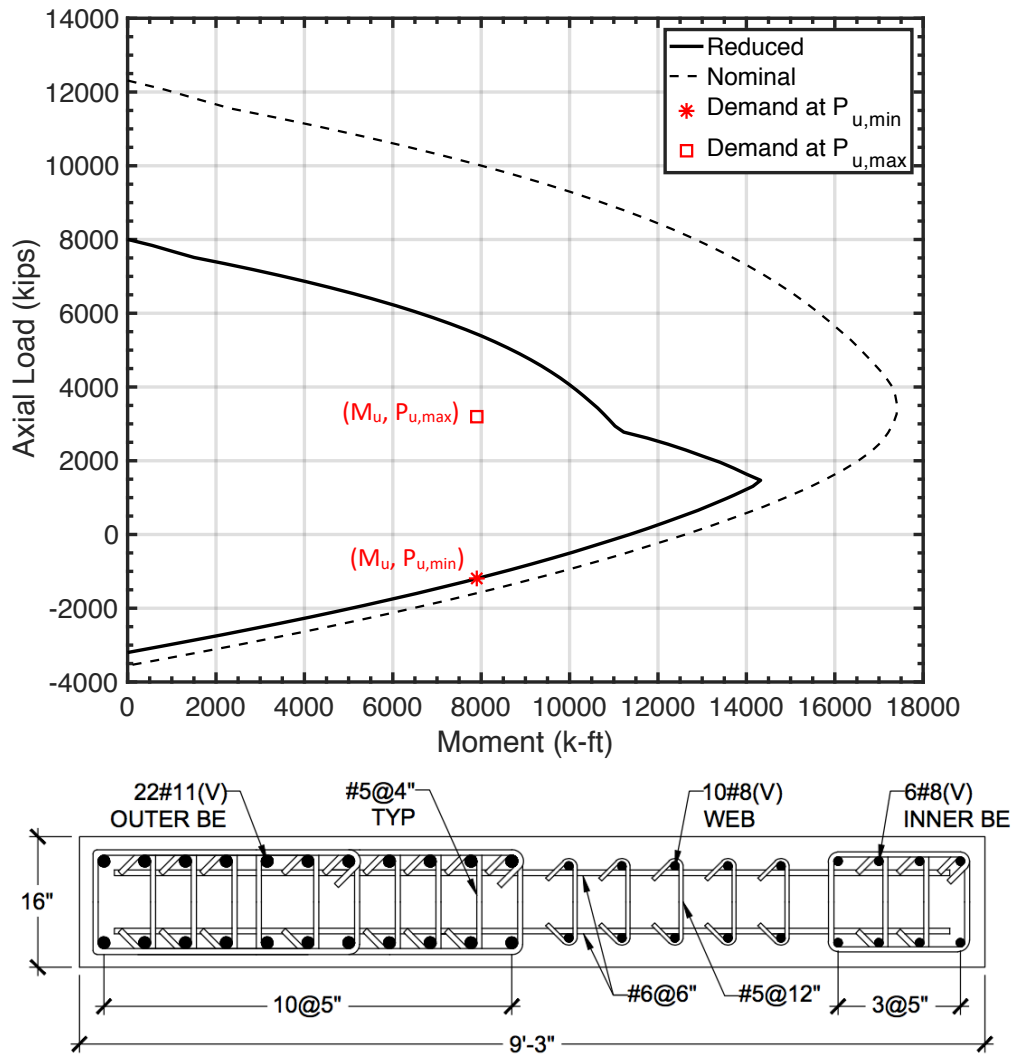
Archetype 12H-DR-3.0 Level 1 Wall Detail and P - M Interaction
